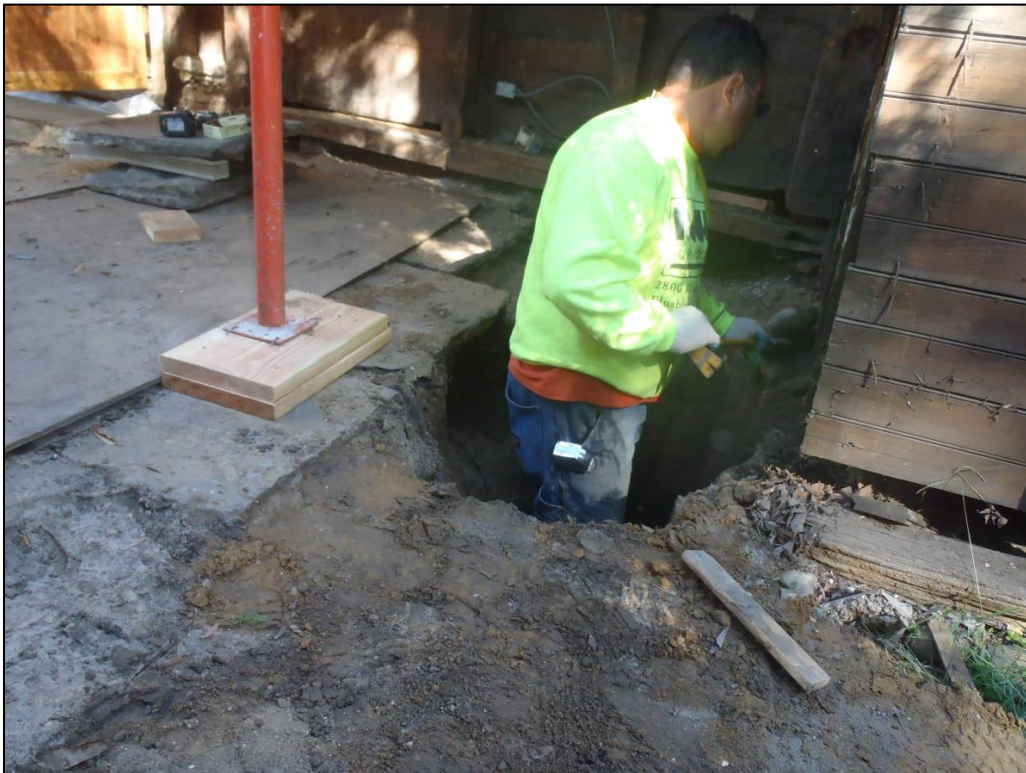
Trench 3 – Excavation in progress; southern house exterior, adjacent to west wall of Room 115.
